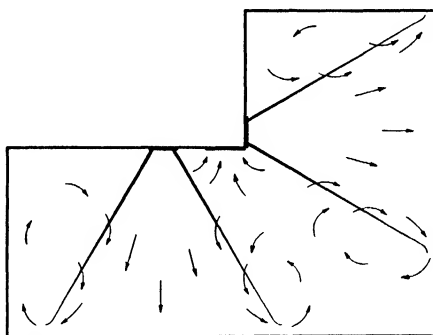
PLAN VIEW TYPICAL GENERAL OFFICE
